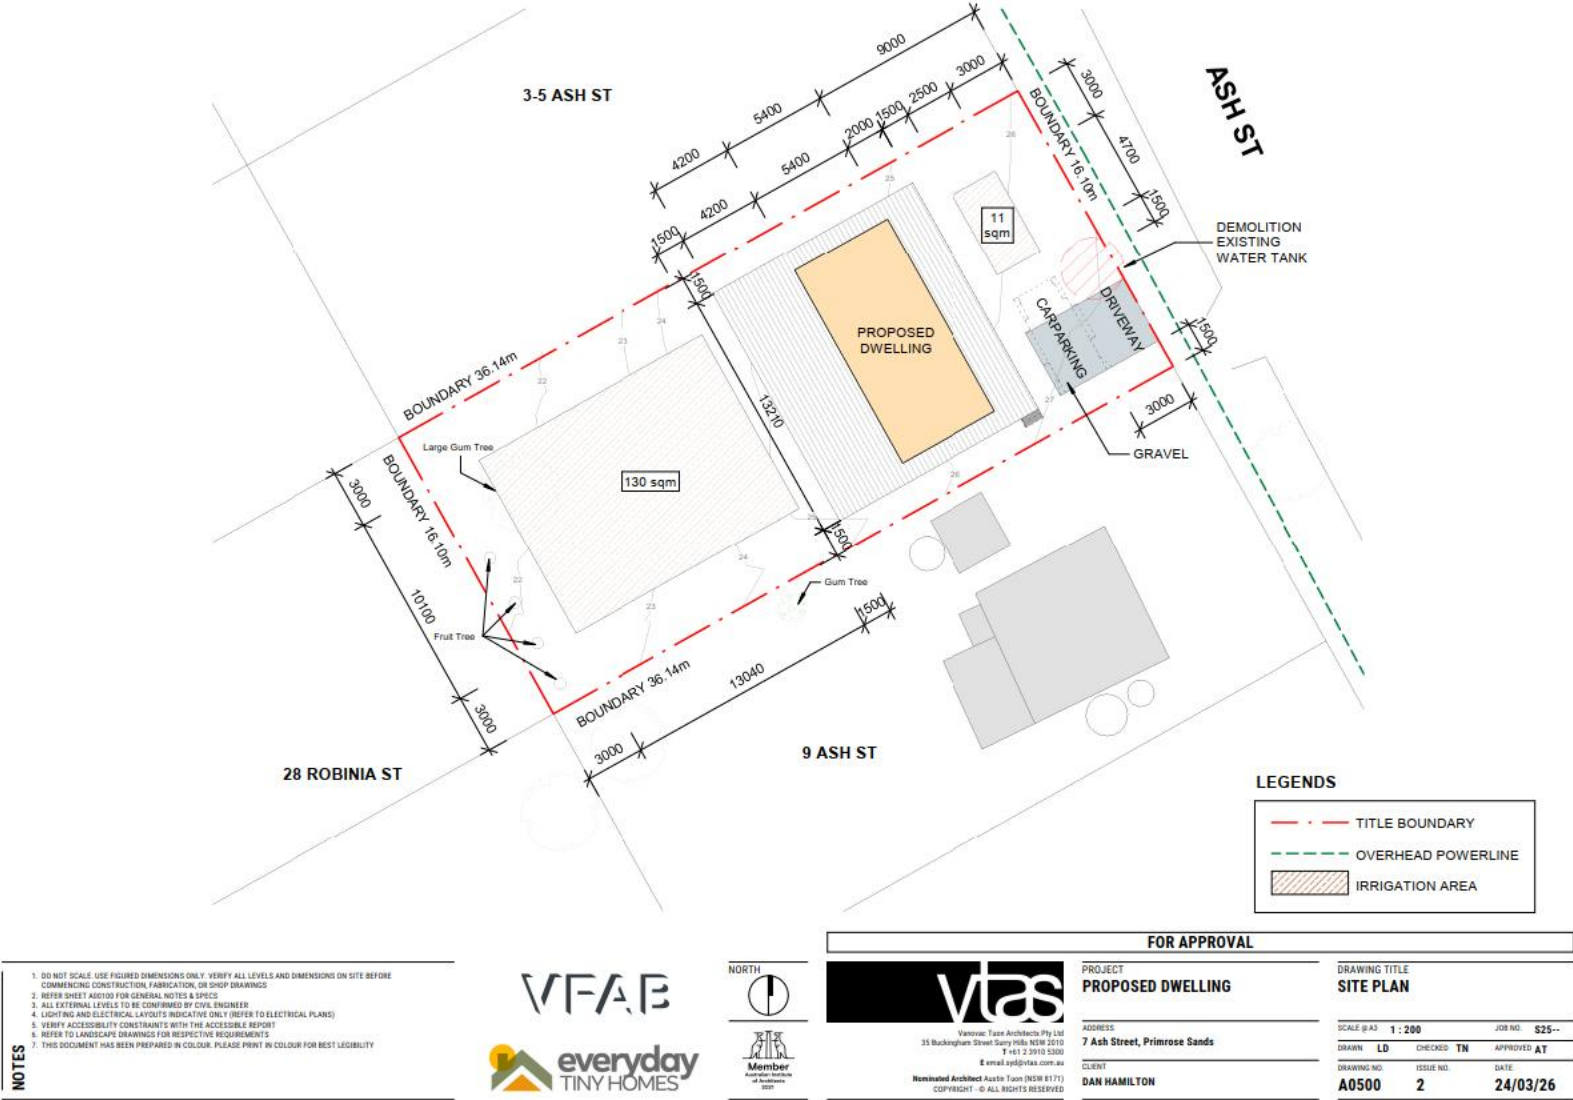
Site Plan showing proposed dwelling is to be constructed on the eastern portion of 7-9 Ash Street, Primrose Sands (Source: VTAS Site Plan).
